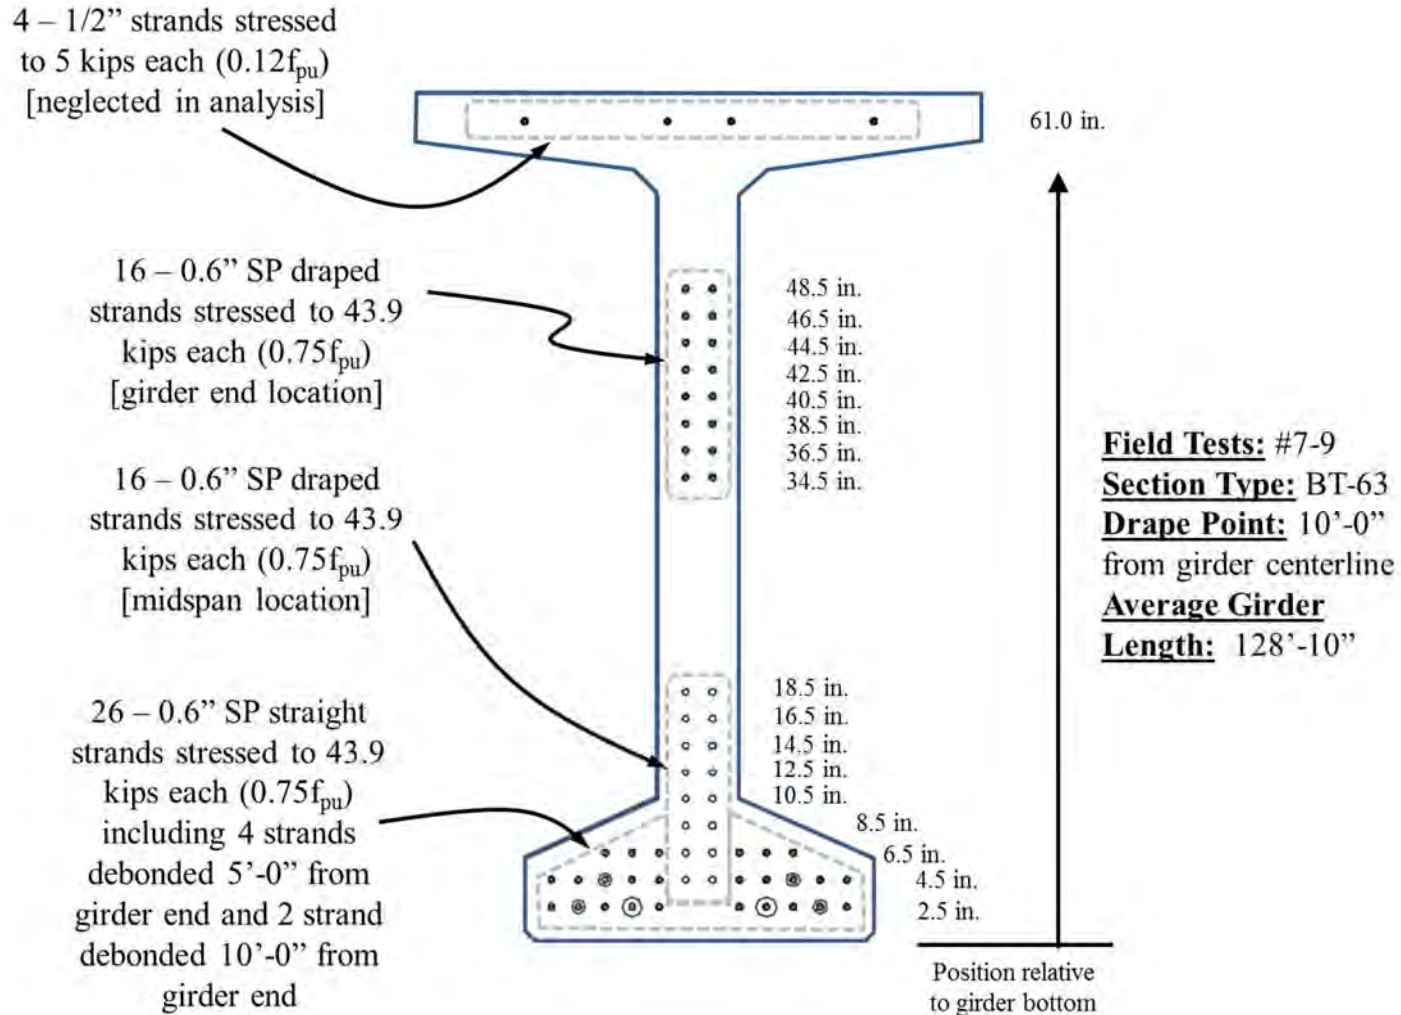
Girder and Prestressing Strand Details for Field Tests #7-9
